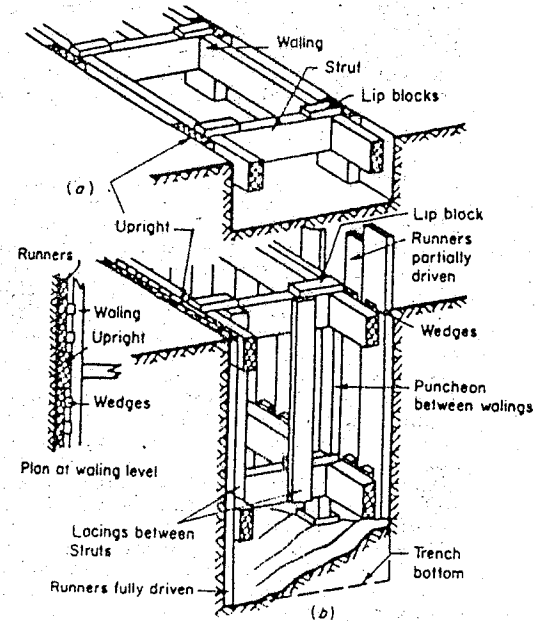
Timbering with runners in a) first, b) second stages of excavation
